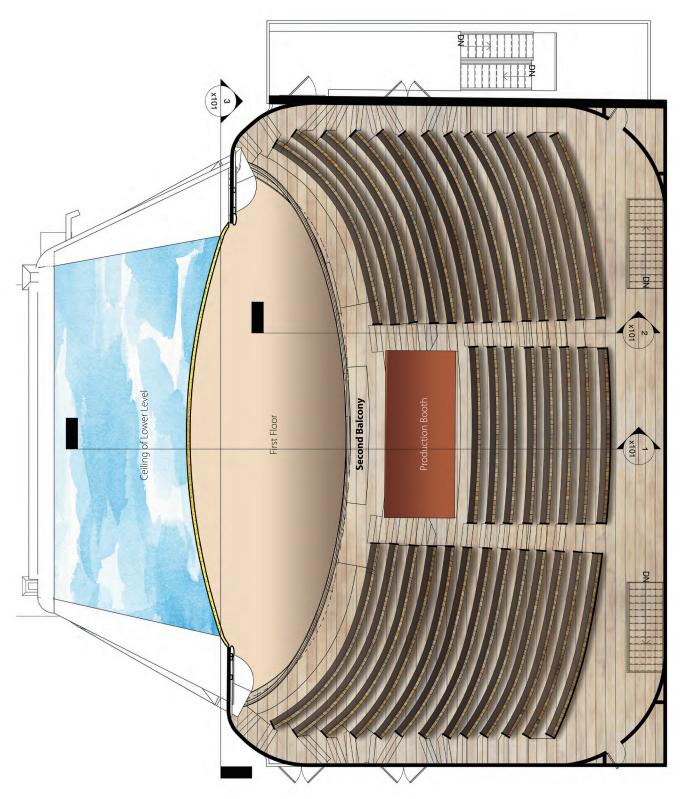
A Plan of the Second Balcony, as Scanned from the Lower Level of the Balcony
